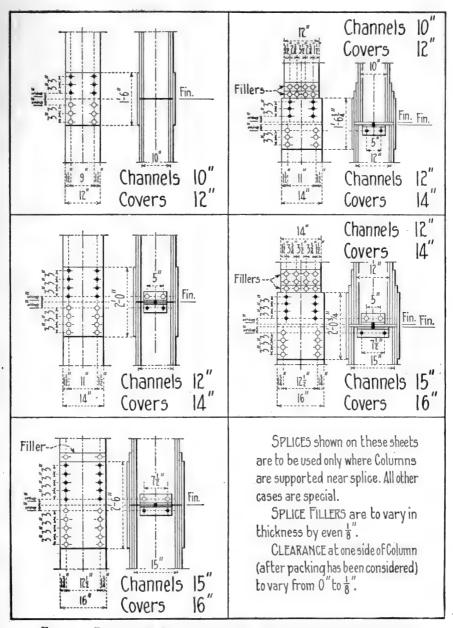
DETAILS OF COLUMN SPLICES. AMERICAN BRIDGE COMPANY.
